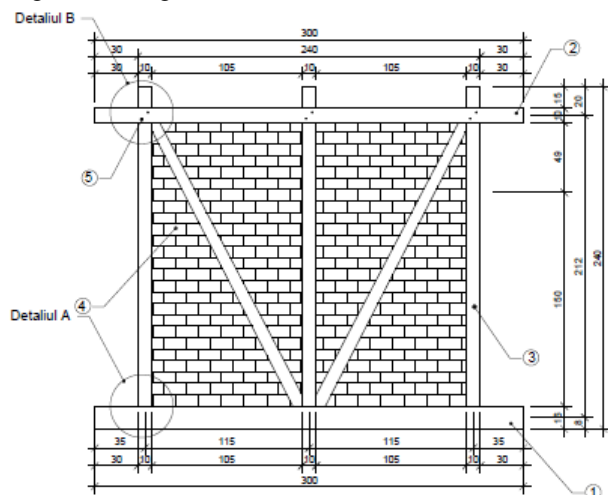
Specimen S1 (from type 1)- timber and brick masonry infill structure: 1 – inferior stringer; 2- superior stringer; 3 – column; 4 – masonry infill; 5 – iron nails and cross – halving connections of timber elements (columns and stringers)
